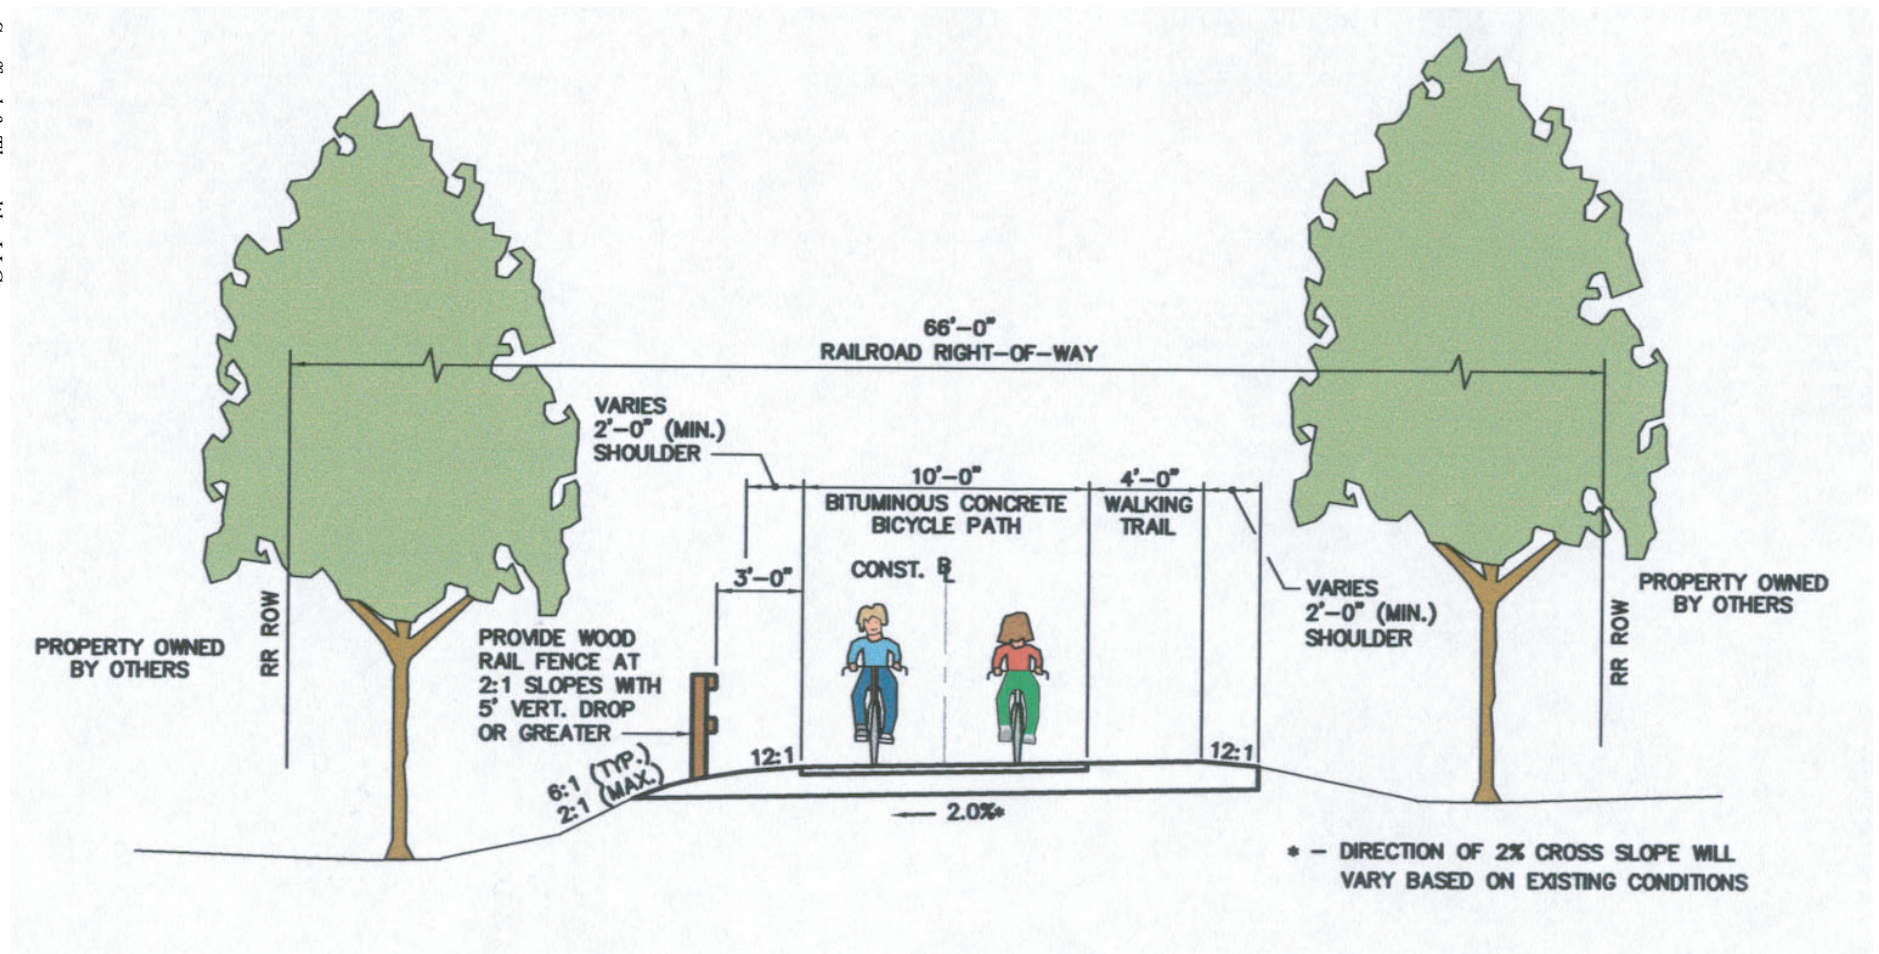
Typical Bicycle Path Cross Section with Walking Trail
